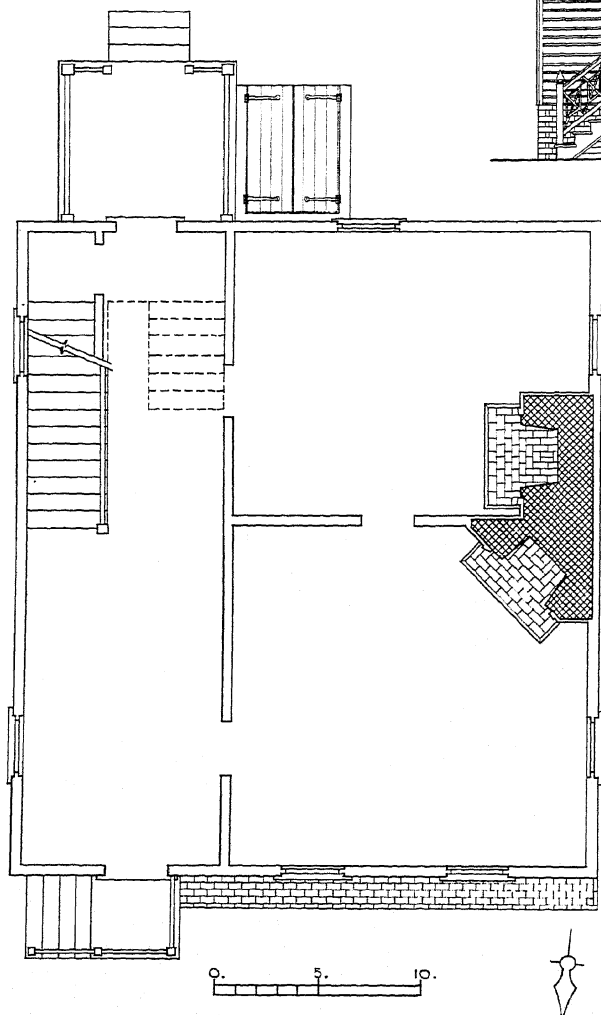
THE LIGHTFOOT HOUSE. Plan.
